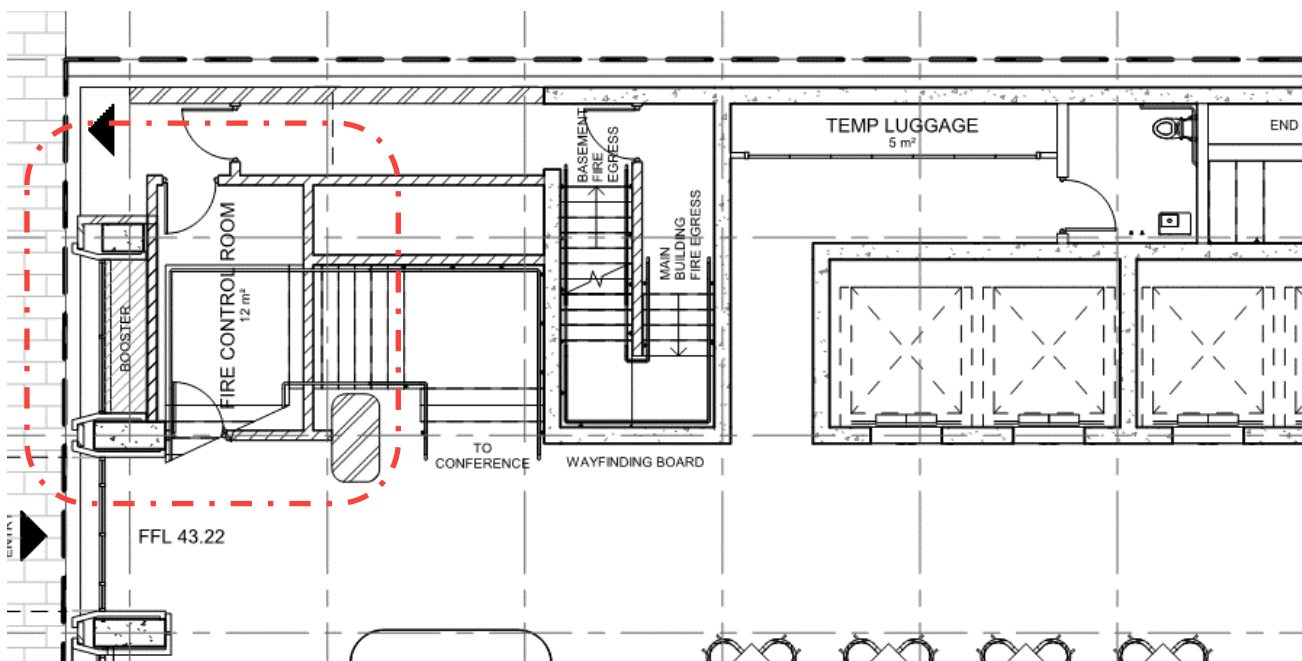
Ground Floor Booster and Fire Control room (with FIP)
